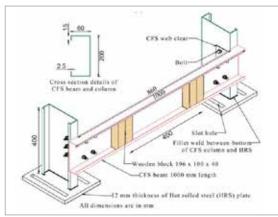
Experimental study of Beam-to-Column connection by bolted clip-angle
